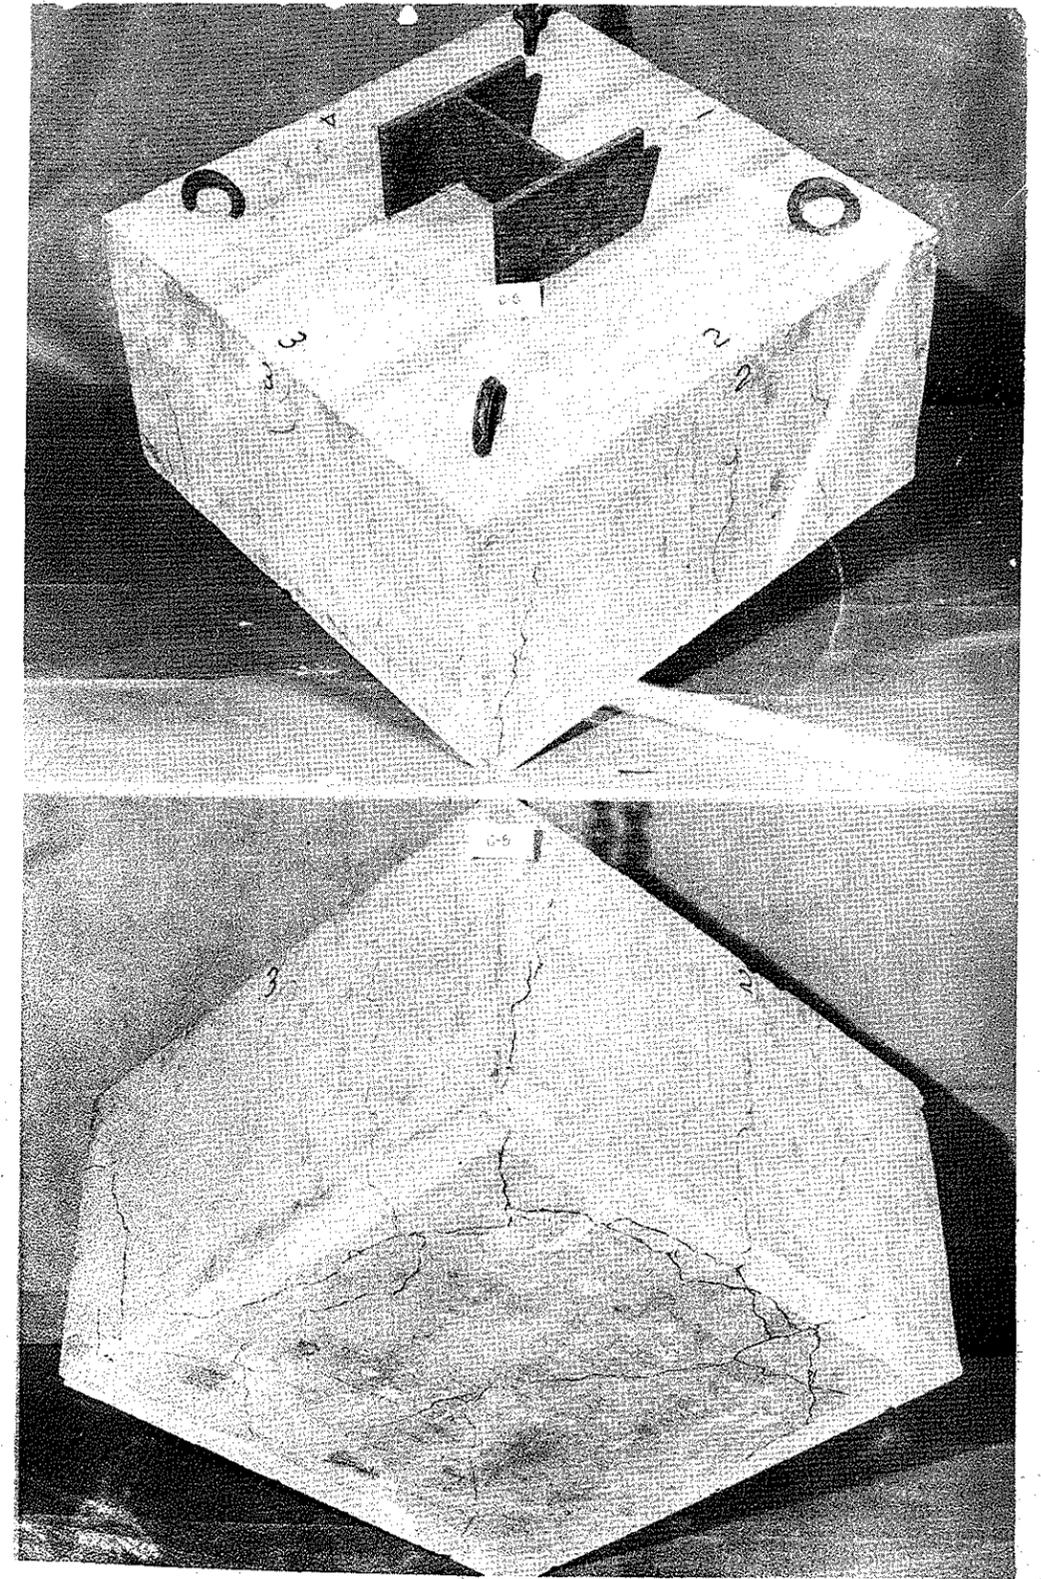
APPEARANCE OF SPECIMEN C-5 AFTER TESTING
